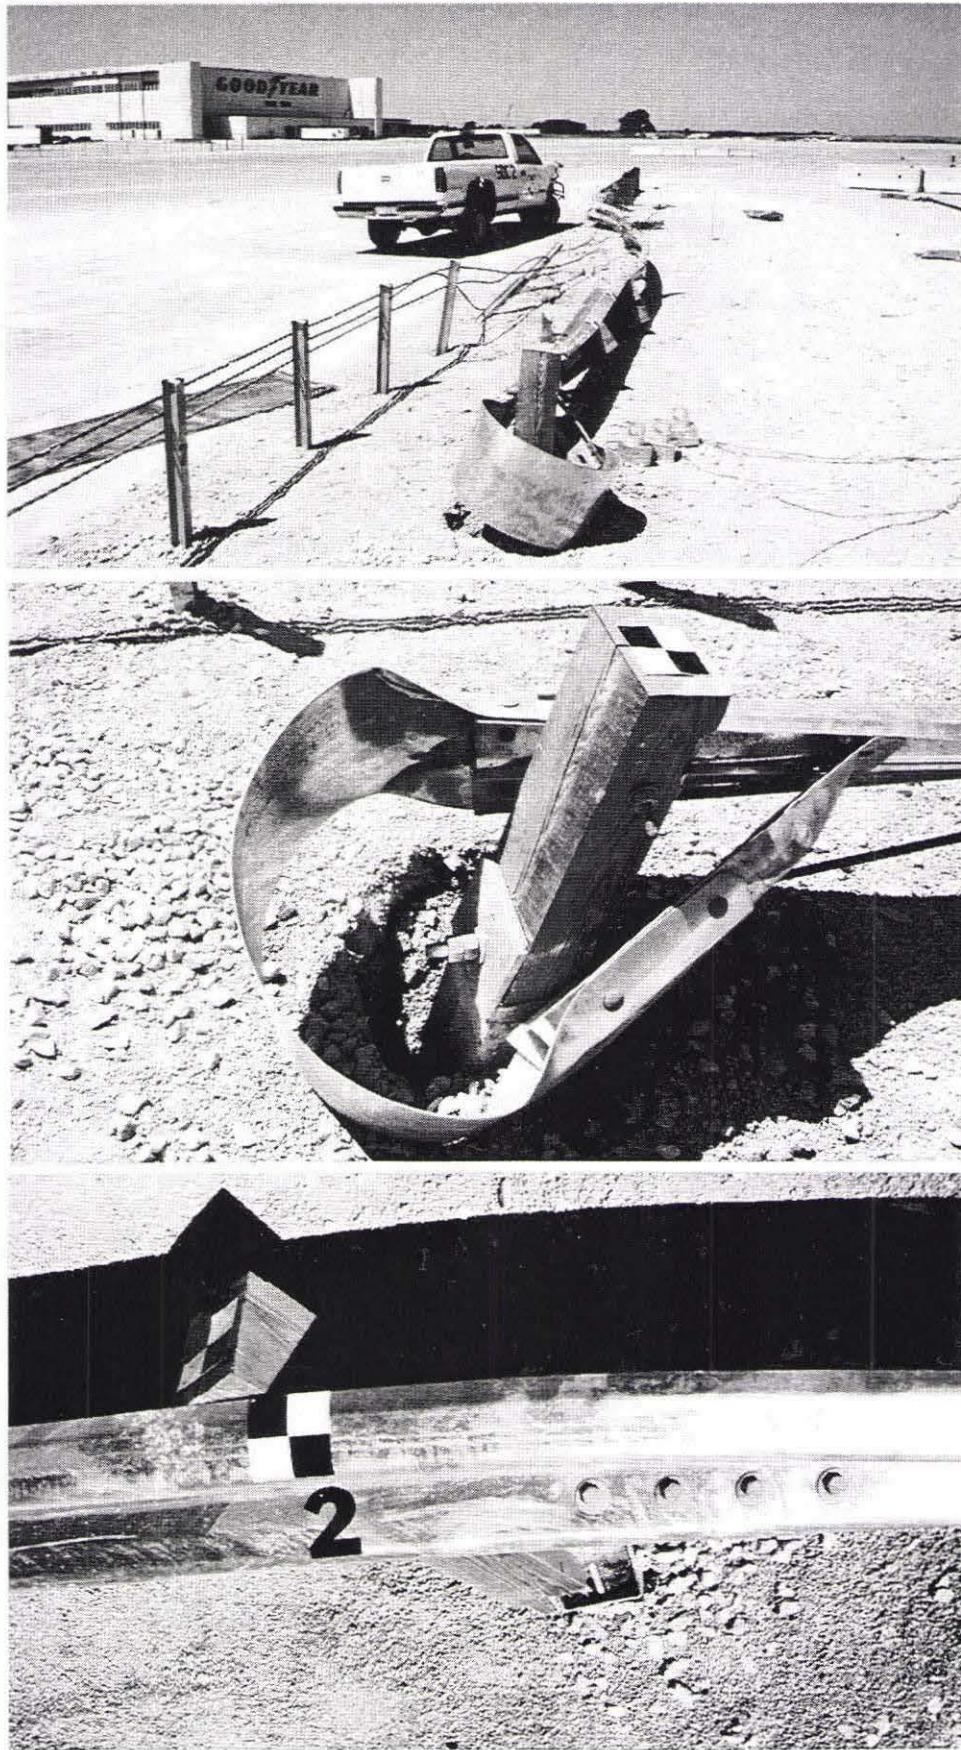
Breakaway Cable Terminal Damage, Test SDC-2
